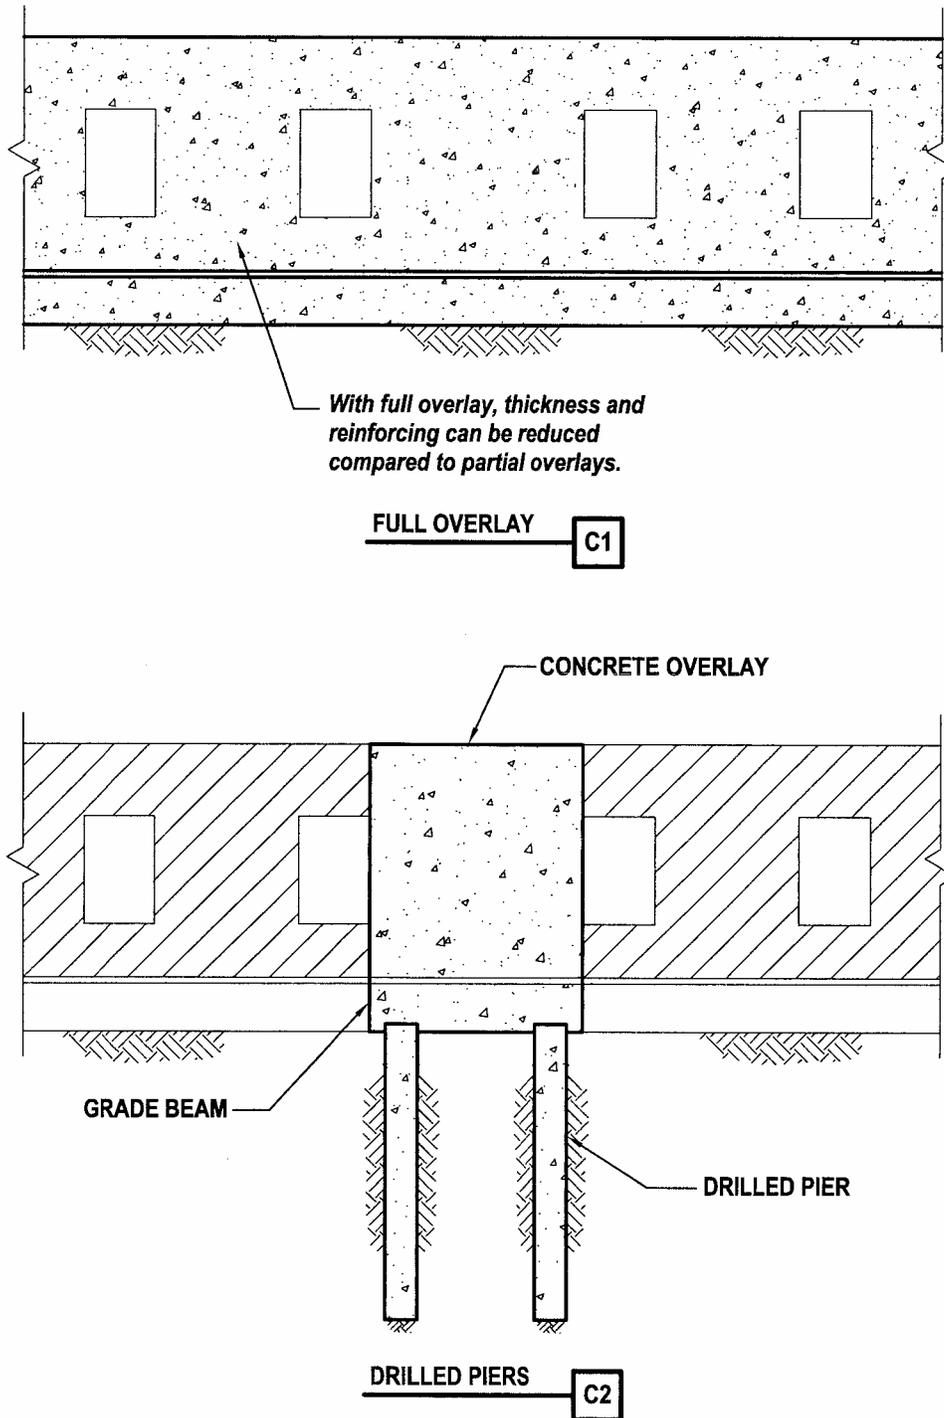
C: Alternatives to Distribute Overturning Loads in Concrete Overlay
